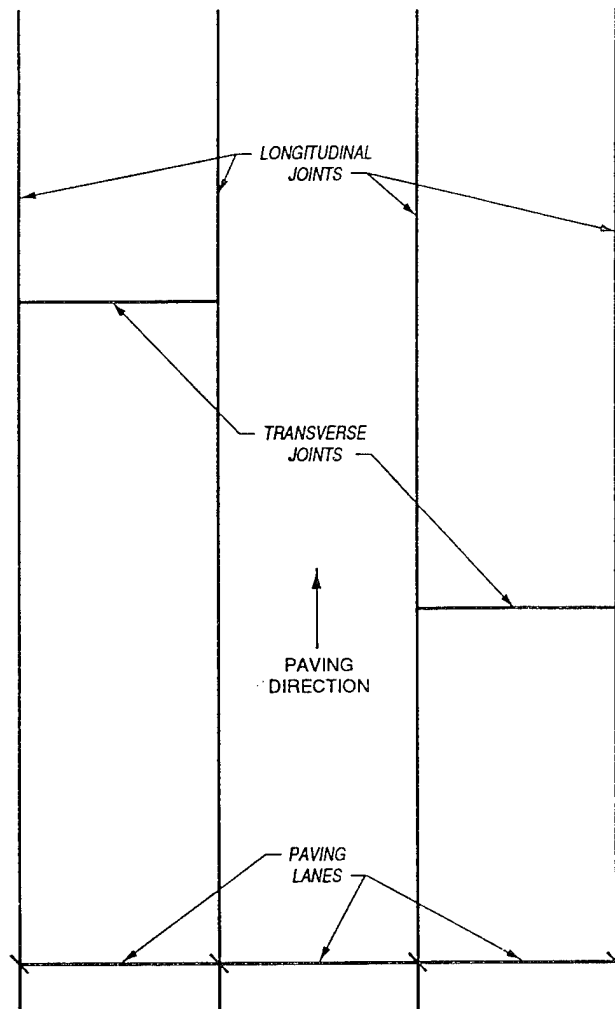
LONGITUDINAL AND TRANSVERSE CONSTRUCTION JOINTS AND PAVING LANES
